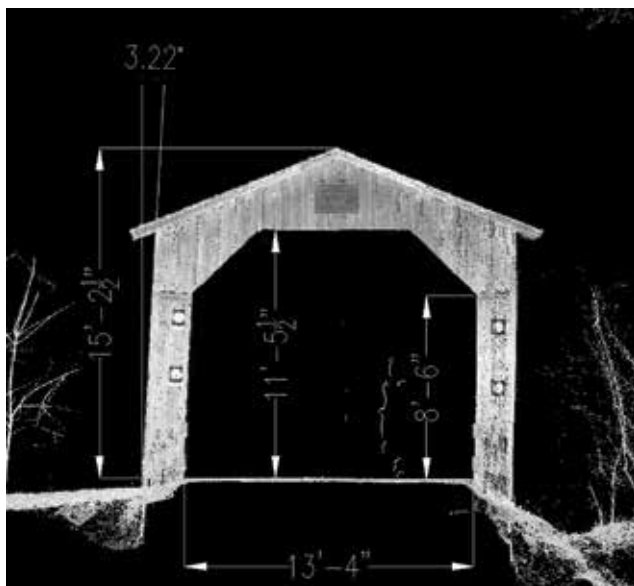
Dimensioned point cloud image of bridge entry on Cedarburg Bridge (SightLine, LLC).
